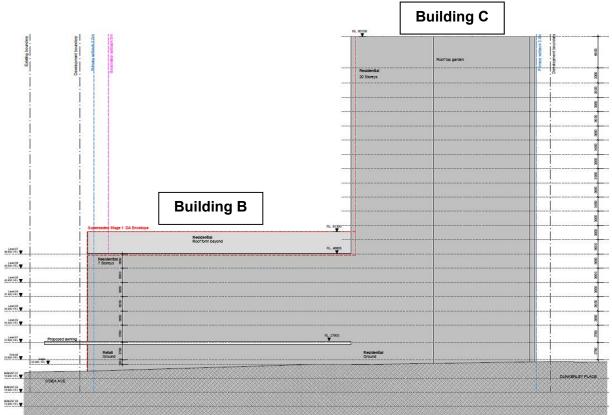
Rope Walk elevation illustrating Building B and Building C envelopes.
